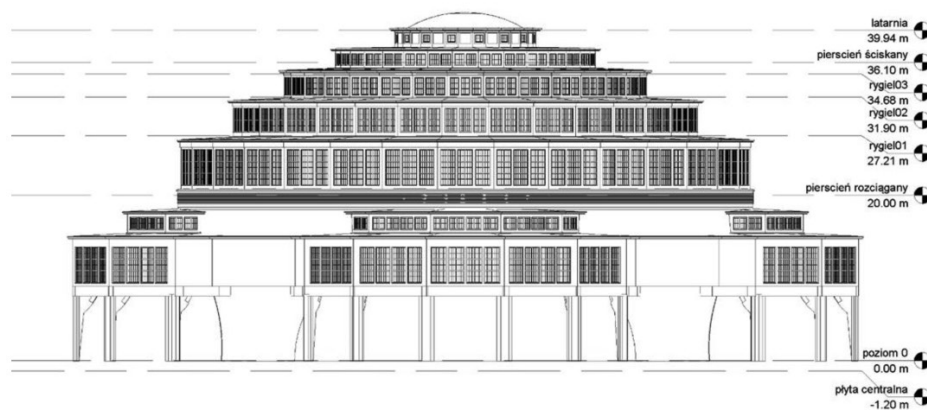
The façade of the Centennial Hall generated from the BIM model.
